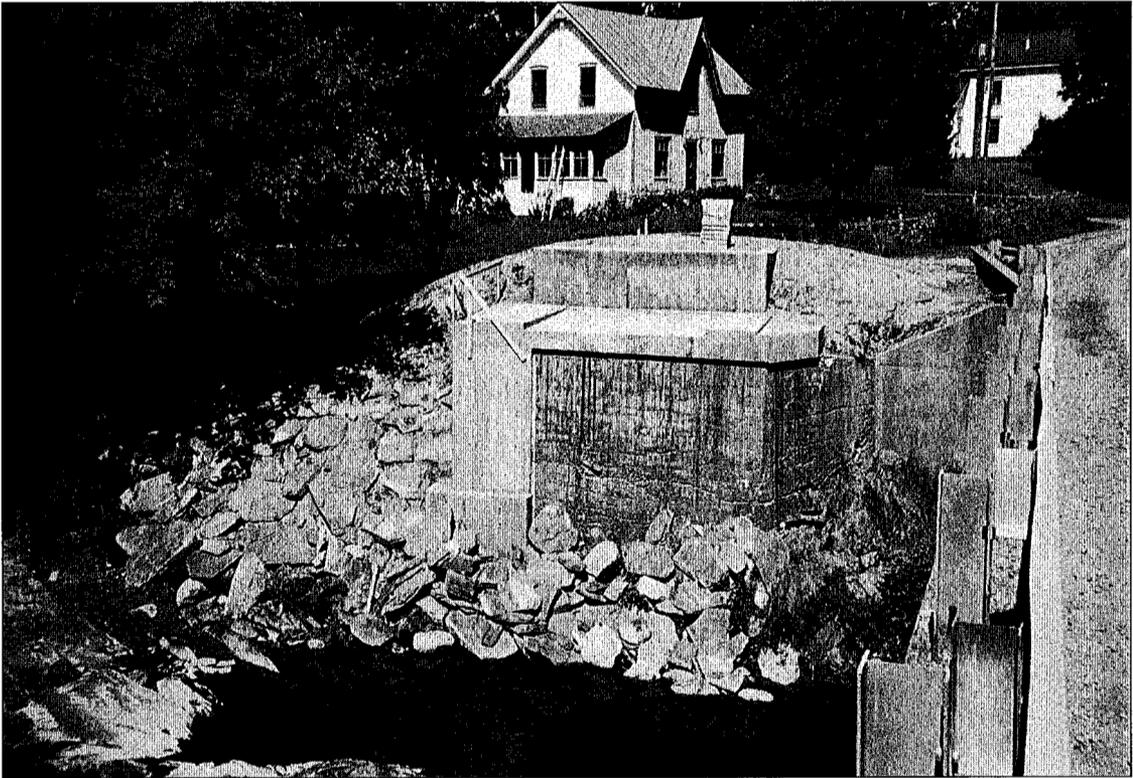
A view of the reconstructed east abutment for the Brown's River Bridge.
